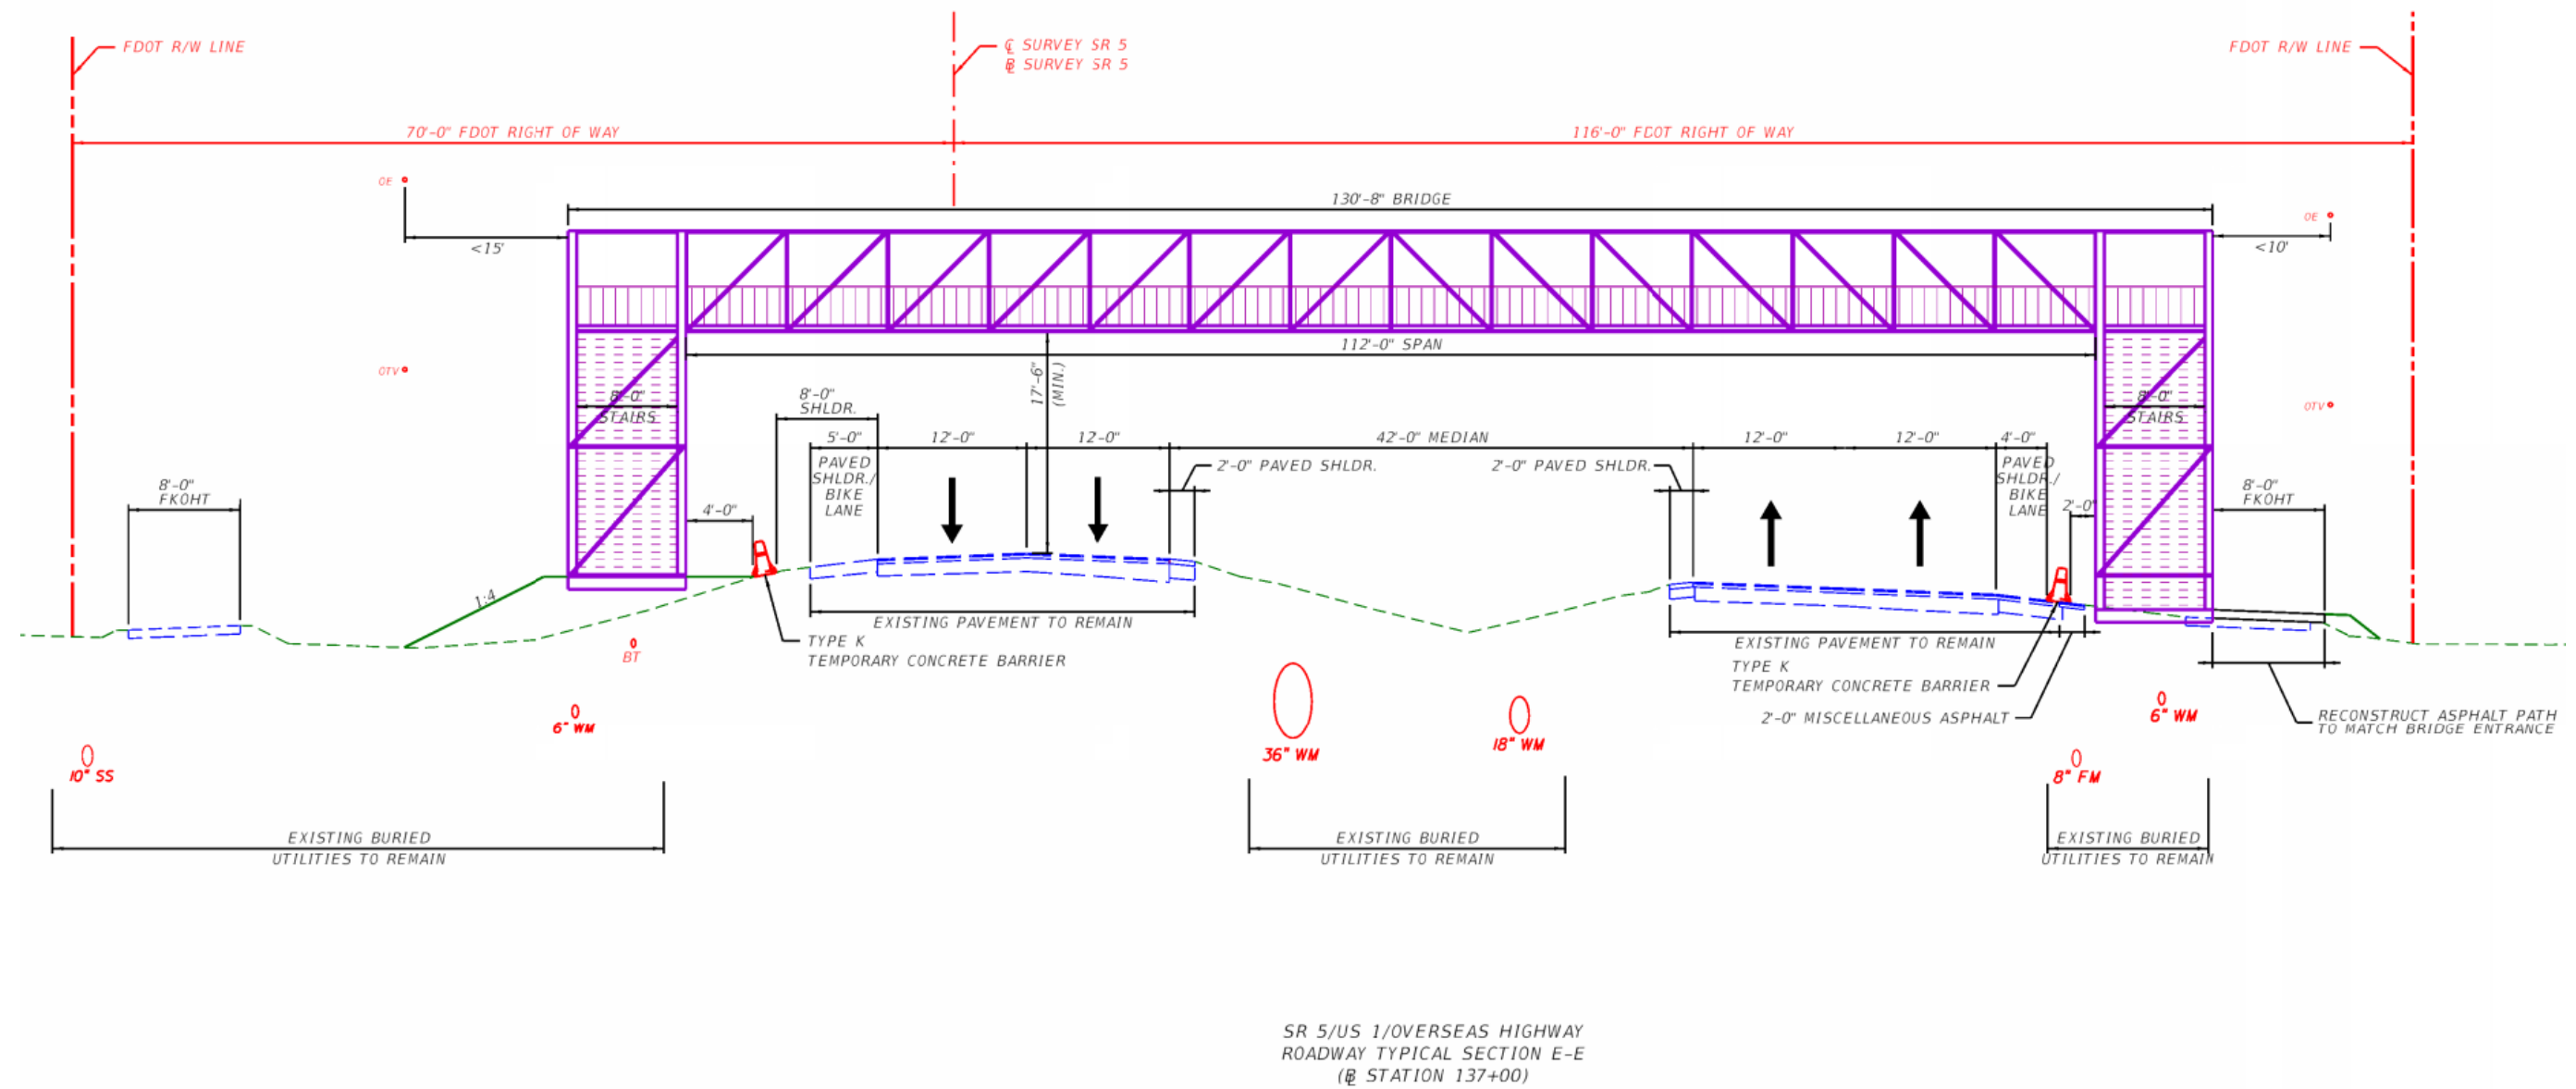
Location 3 Temporary Pedestrian Bridge Concept – Structural Plan & Elevation
